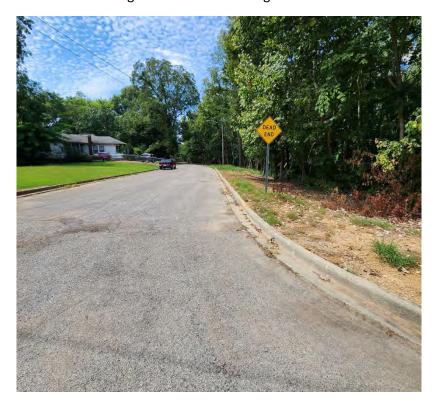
View looking west down APE along Macon Street at Lamplighter Lane in Forestdale.
